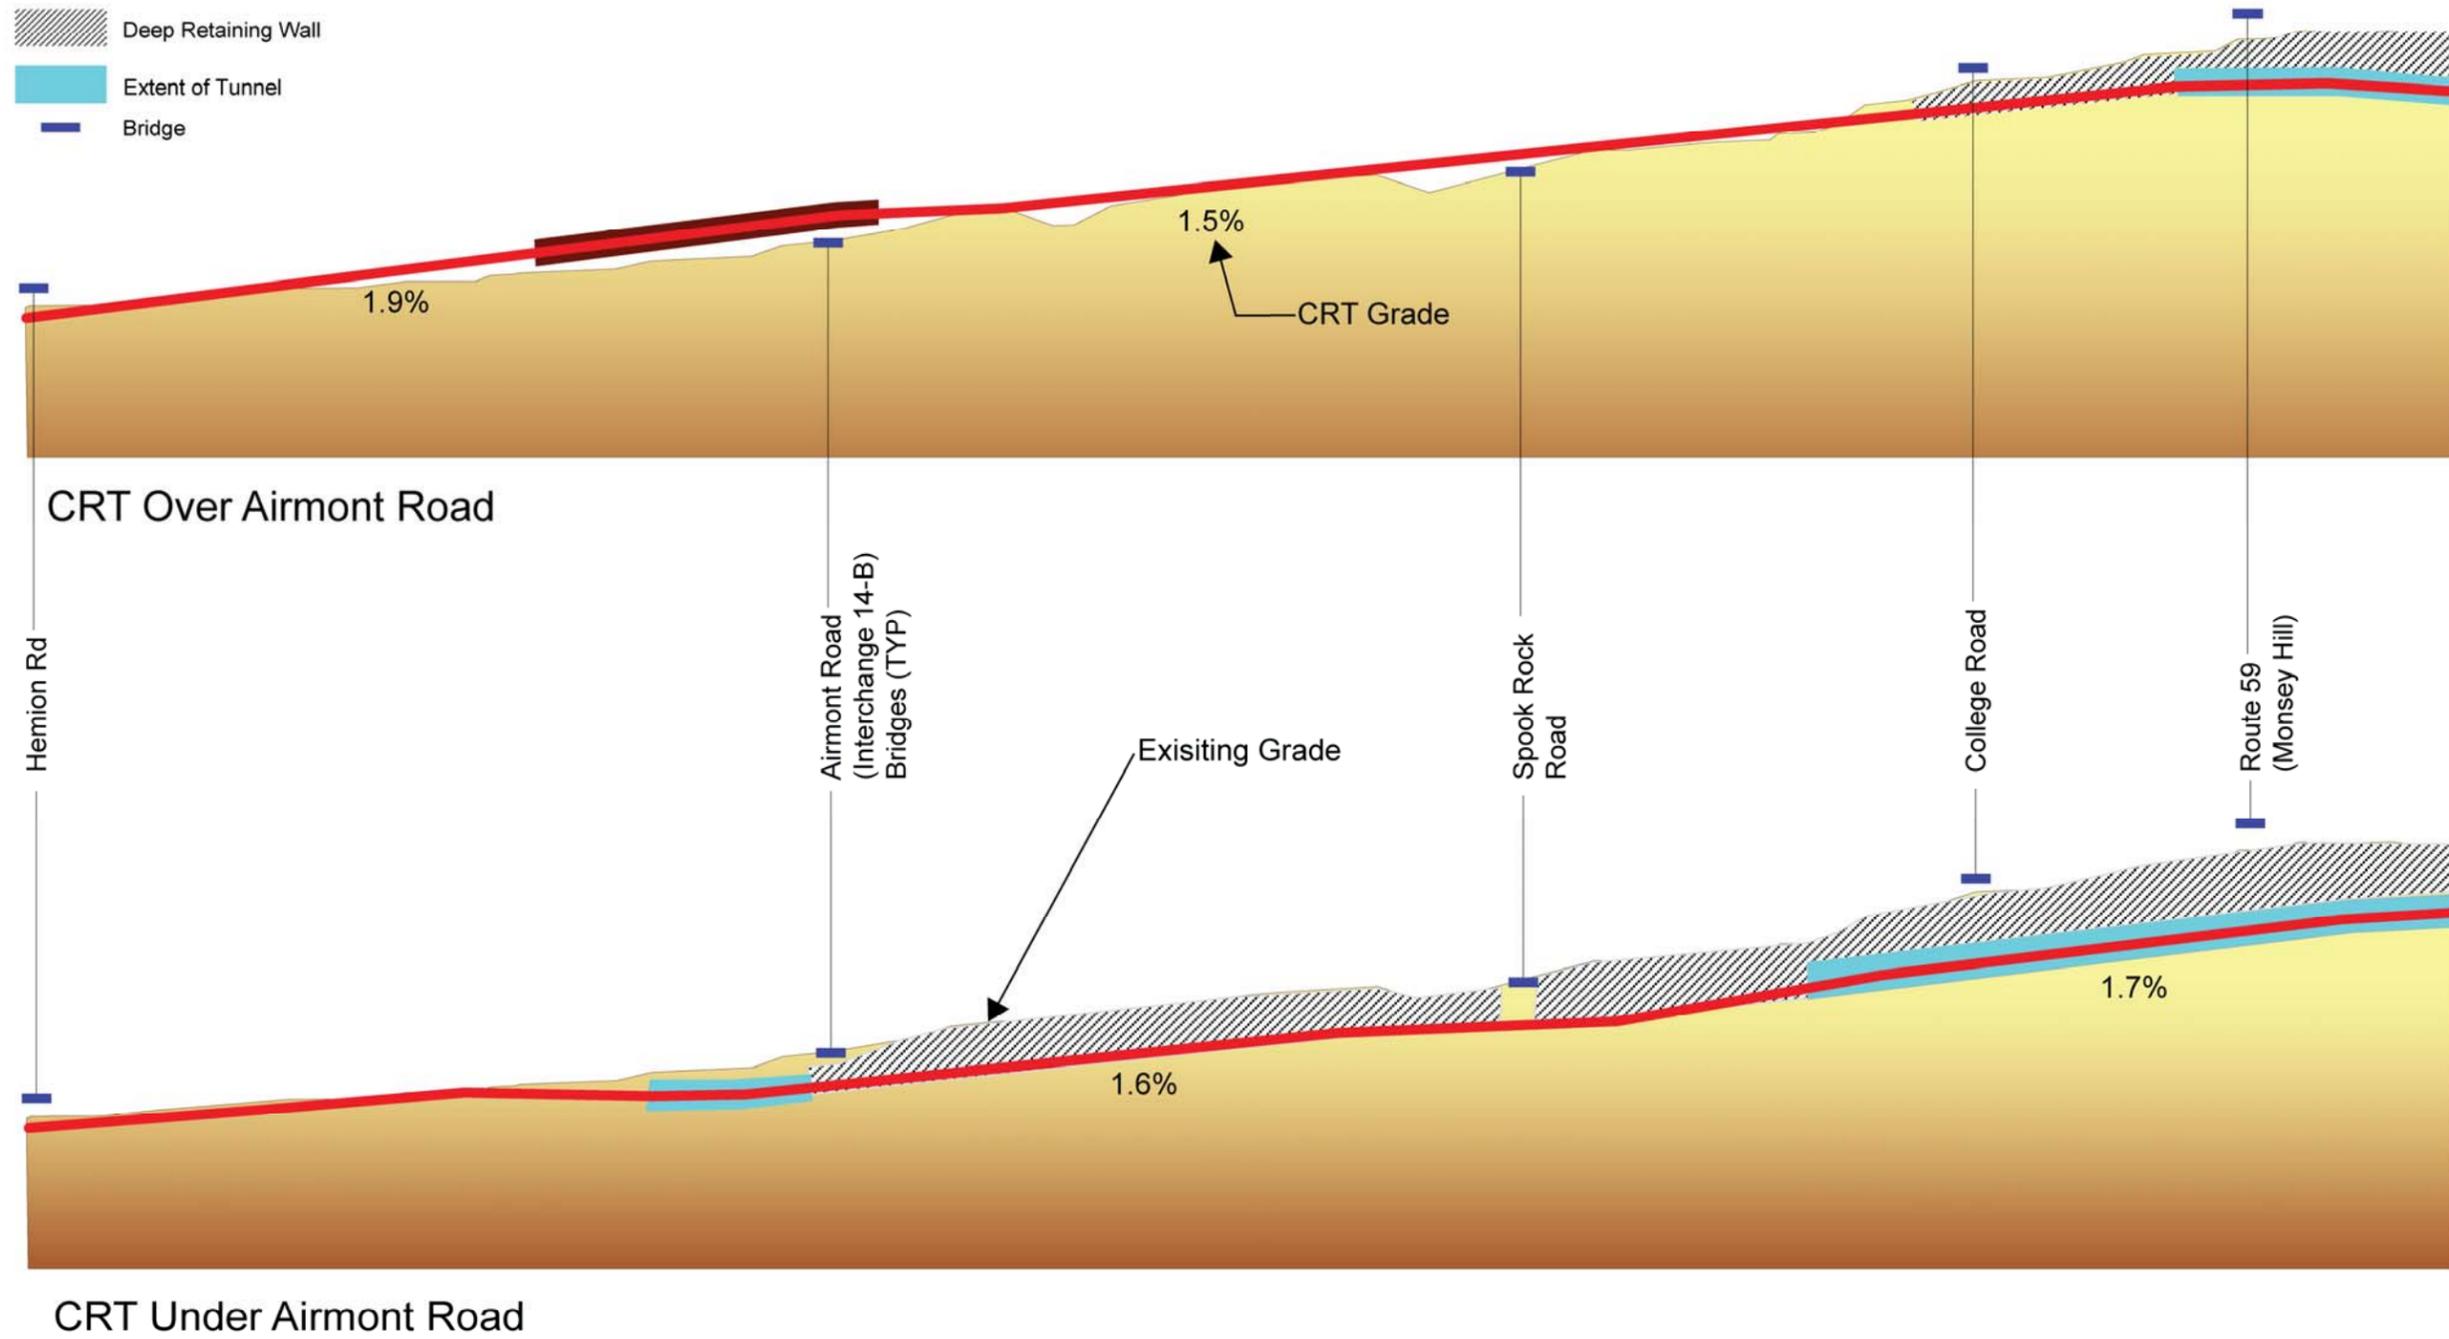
Profile of CRT Options Over and Under Airmont Road
